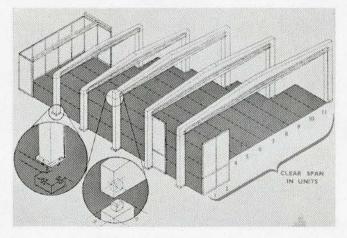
Uni-Seco Structures—"Aero" Beams and Columns—scientifically designed hollow units built up from plywood in order to achieve strength coupled with lightness and economy in materials.
